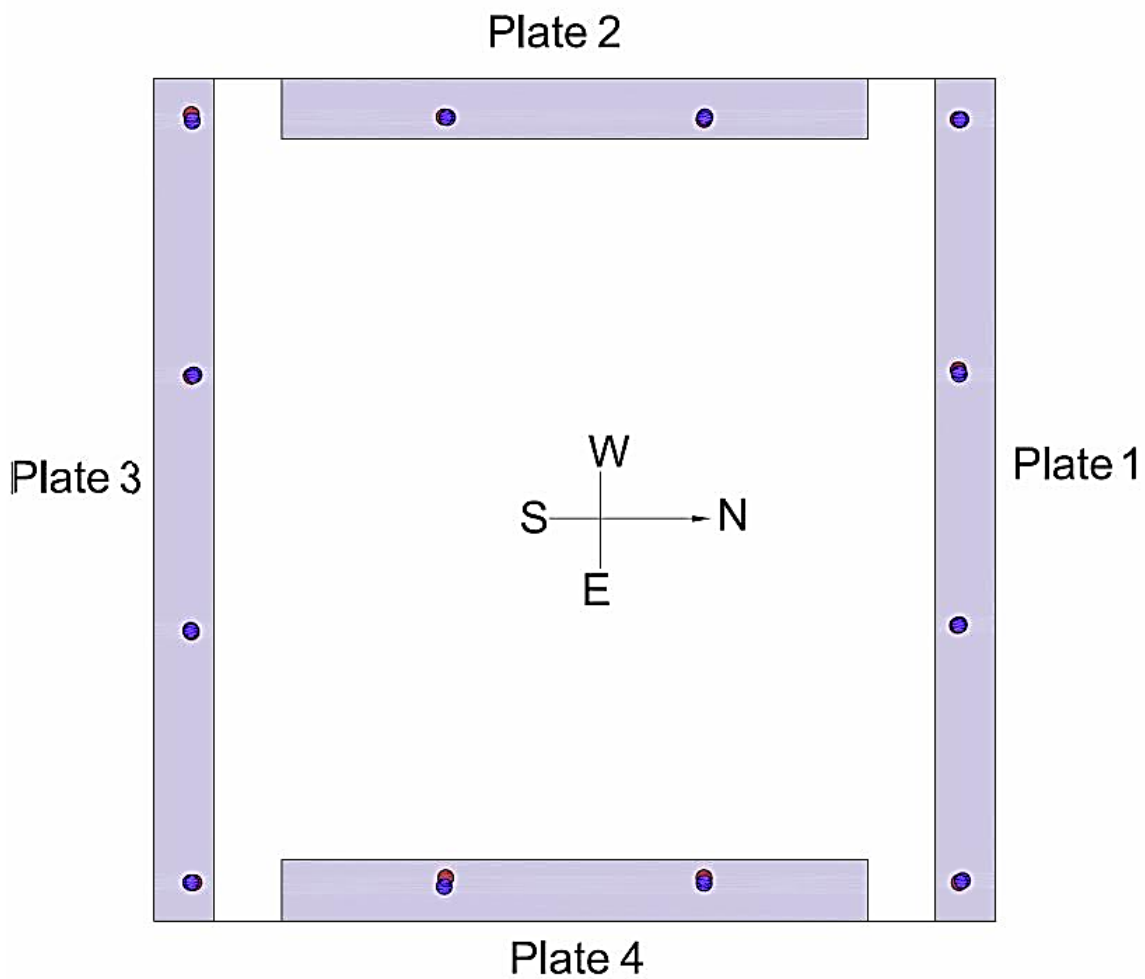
Typical Arrangement of Steel Plates on Test Specimens
